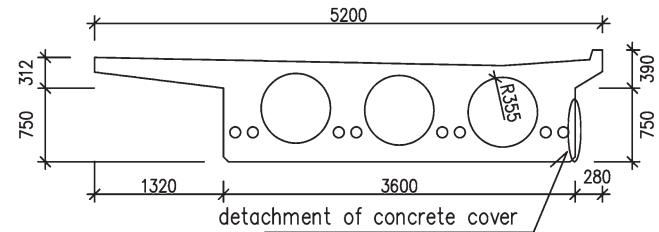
Location of concrete cover spalling in a cross section.
